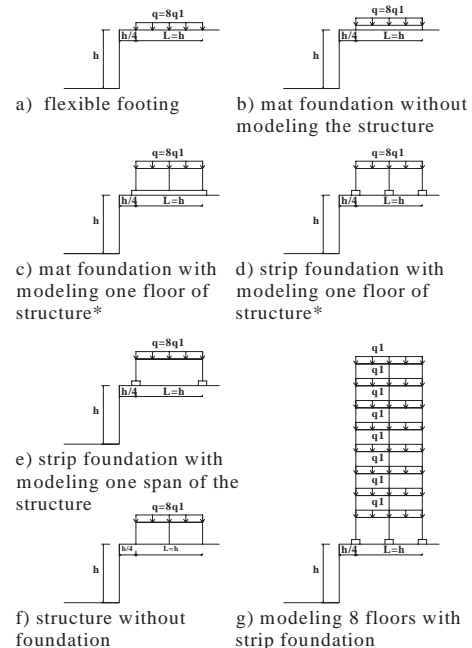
seven modelling types examined for structural modelling of neighbouring buildings
